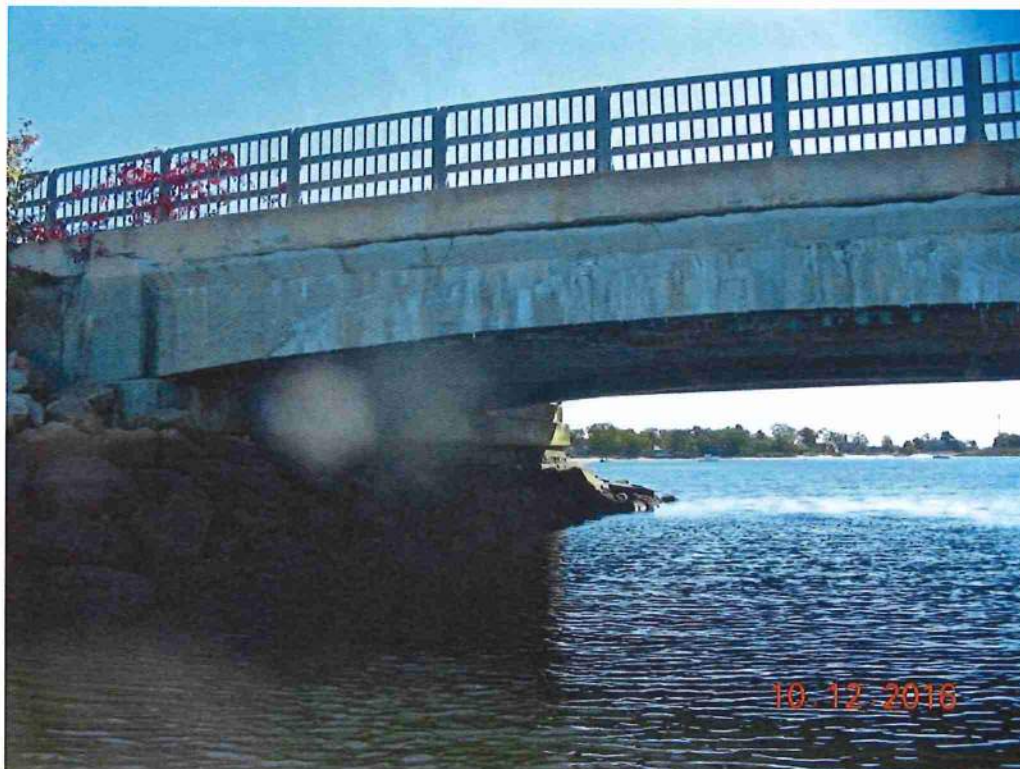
Span 2 Tee Beam 1 north face, horizontal & diagonal cracking w/ efflo
